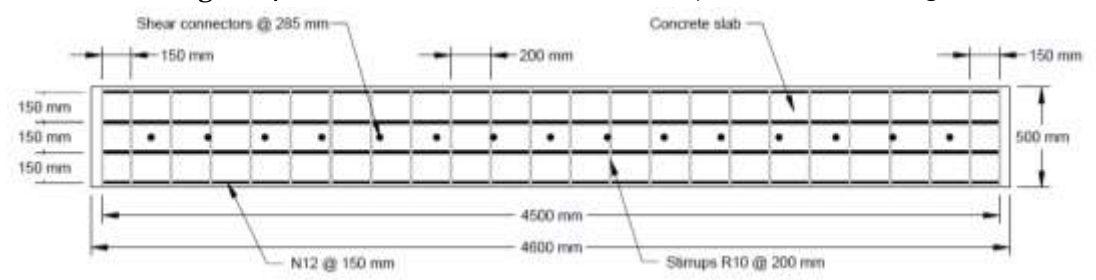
Plan view for CBP-1, CBP-2 and CBP-3
